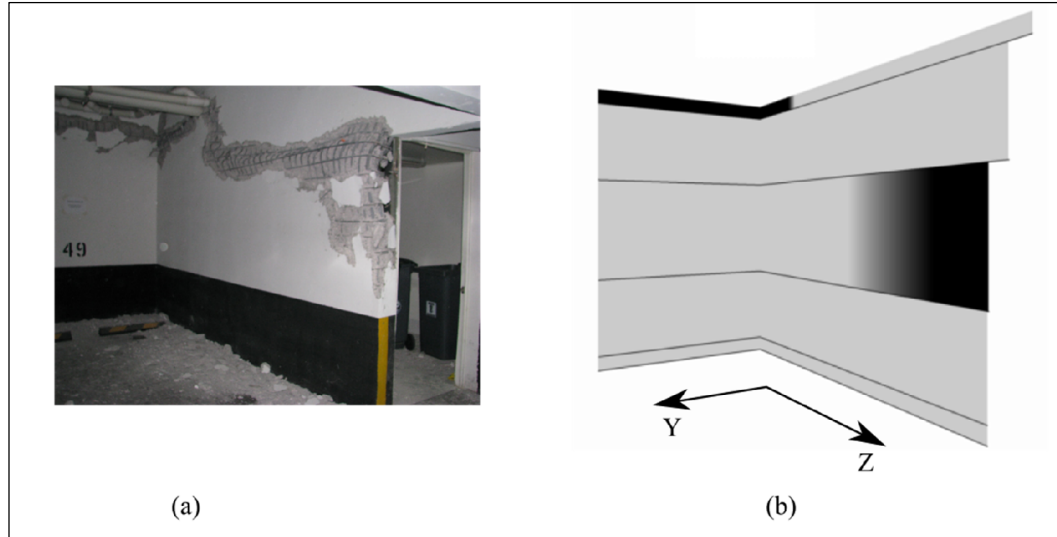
Damage reproduction of the reinforced concrete wall WL. a) Actual damage, b) calculated damage (in black).
